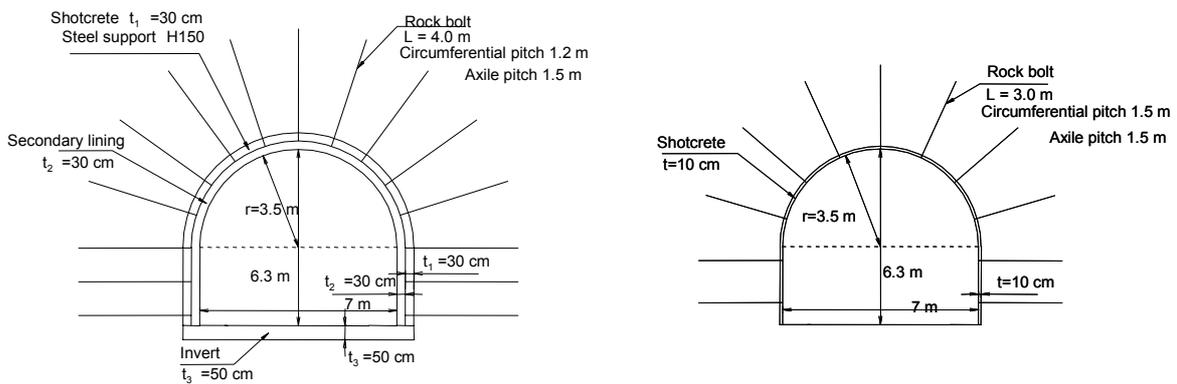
Cross-section of main tunnel and connecting tunnel
